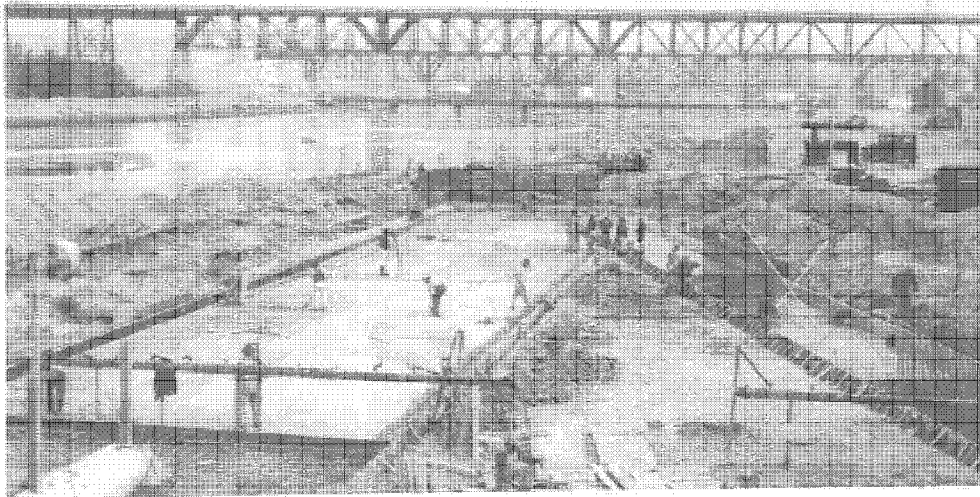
Pouring Concrete for the American Canal Headworks, 10 November 1937.
